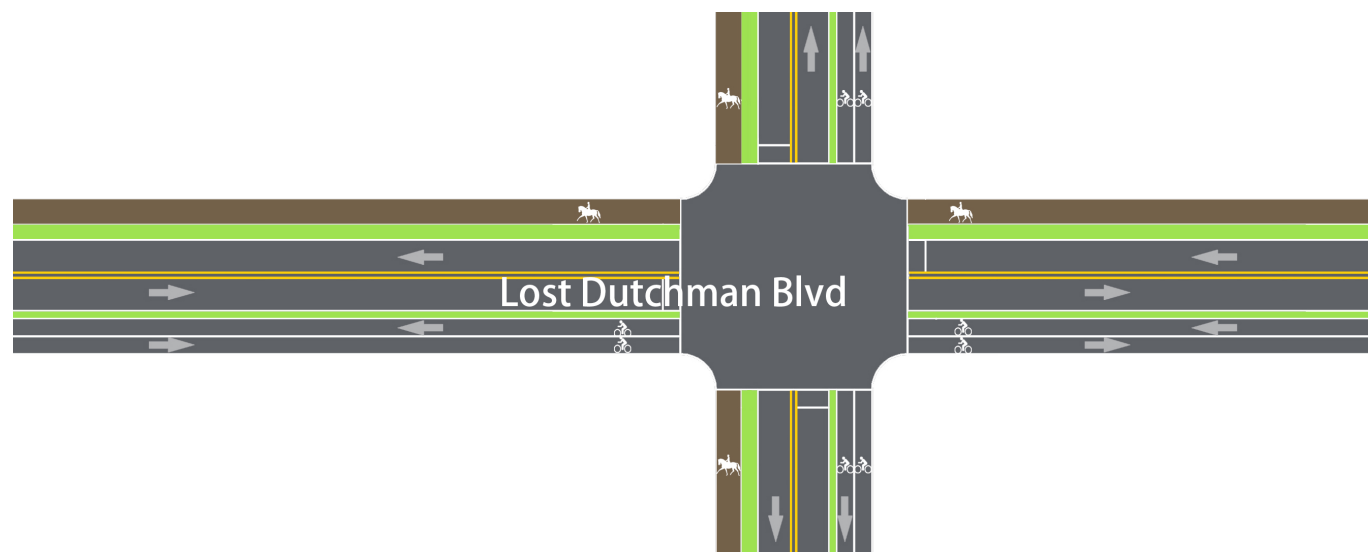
Proposed street design for Lost Dutchman Boulevard
